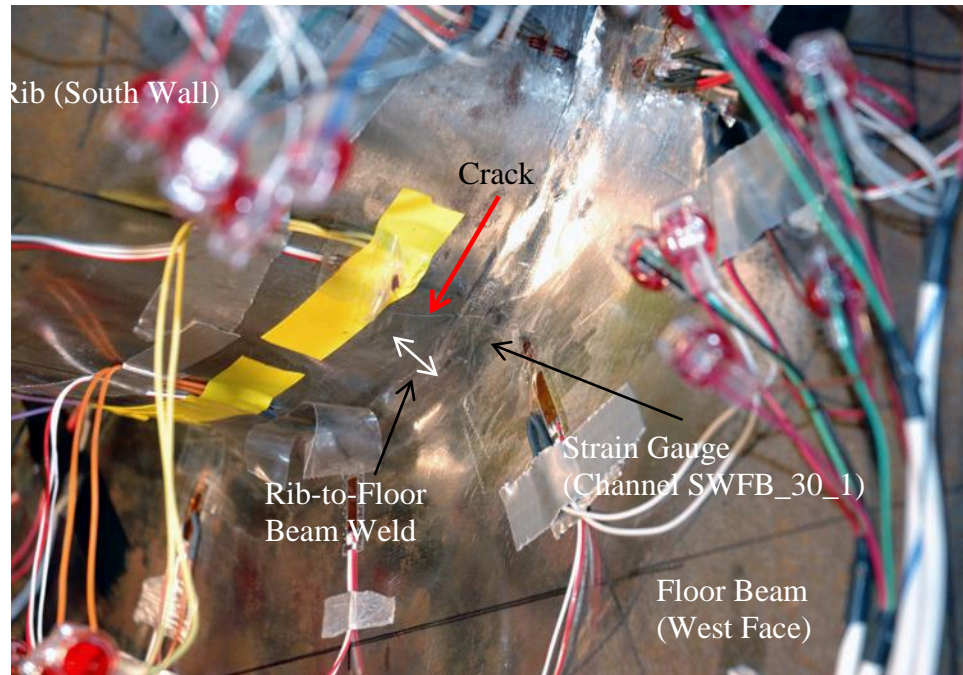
Crack at the floor beam-to-rib welded connection in the mock-up specimen MU1 – south west
